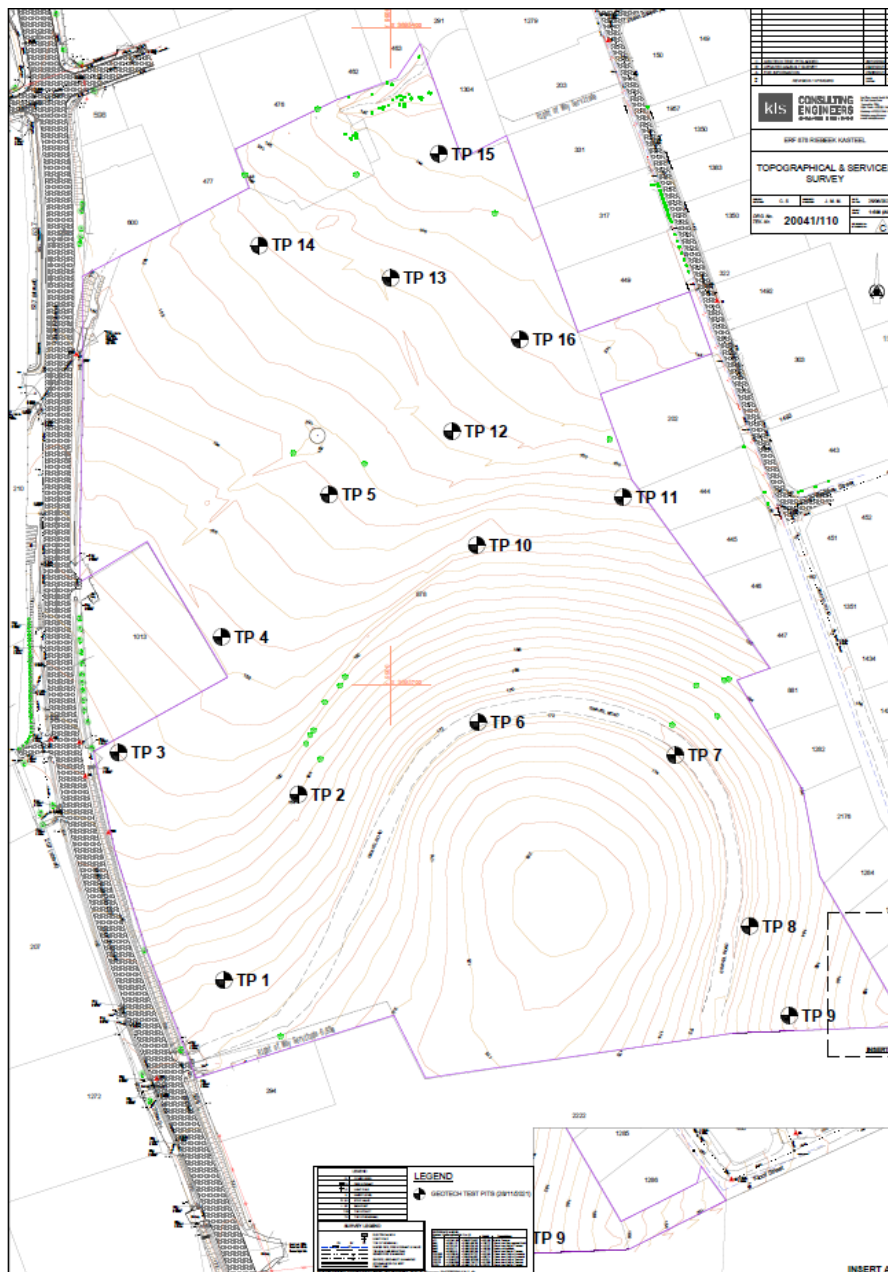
Layout of Trial Pits – also shown on Appendix B
